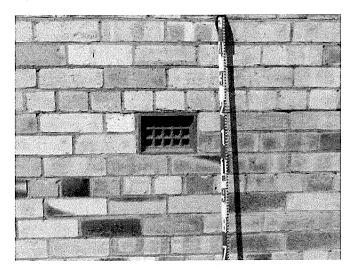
ACMA Facility main building air vent and brick bond detail south west wall.
